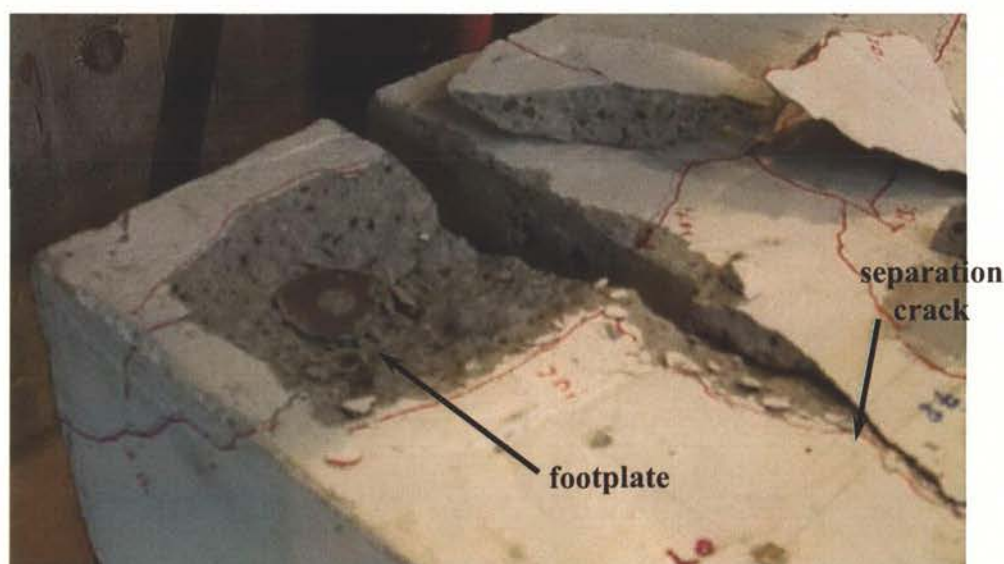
Damage to corner half-hinge joint at north end, at 2.0% drift.
